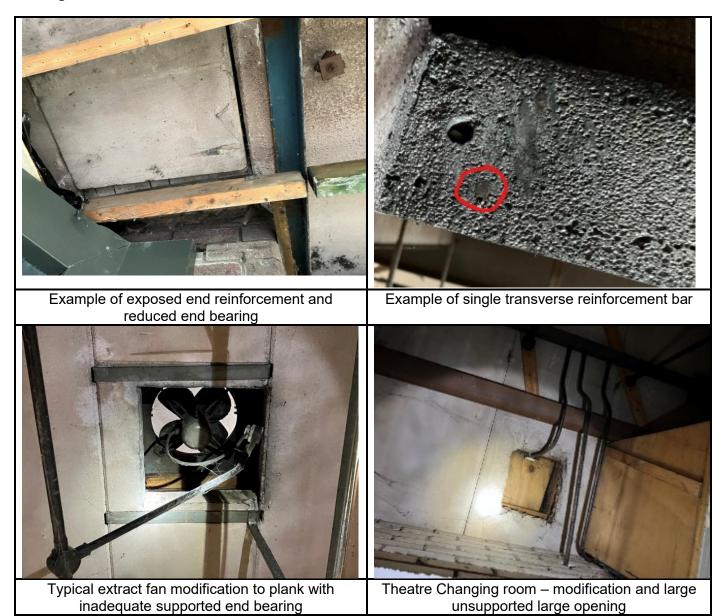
Examples of modification and penetrations to planks. Source Thomas Consulting (2023).
